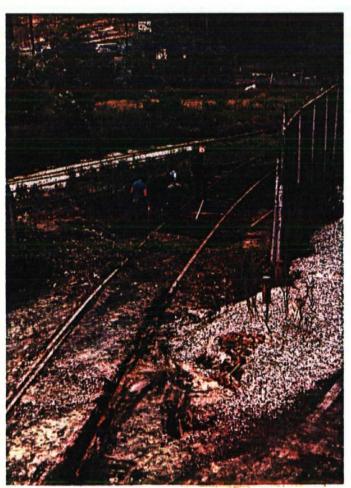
Rail Spur Renovation by Gate. 5/31/85
